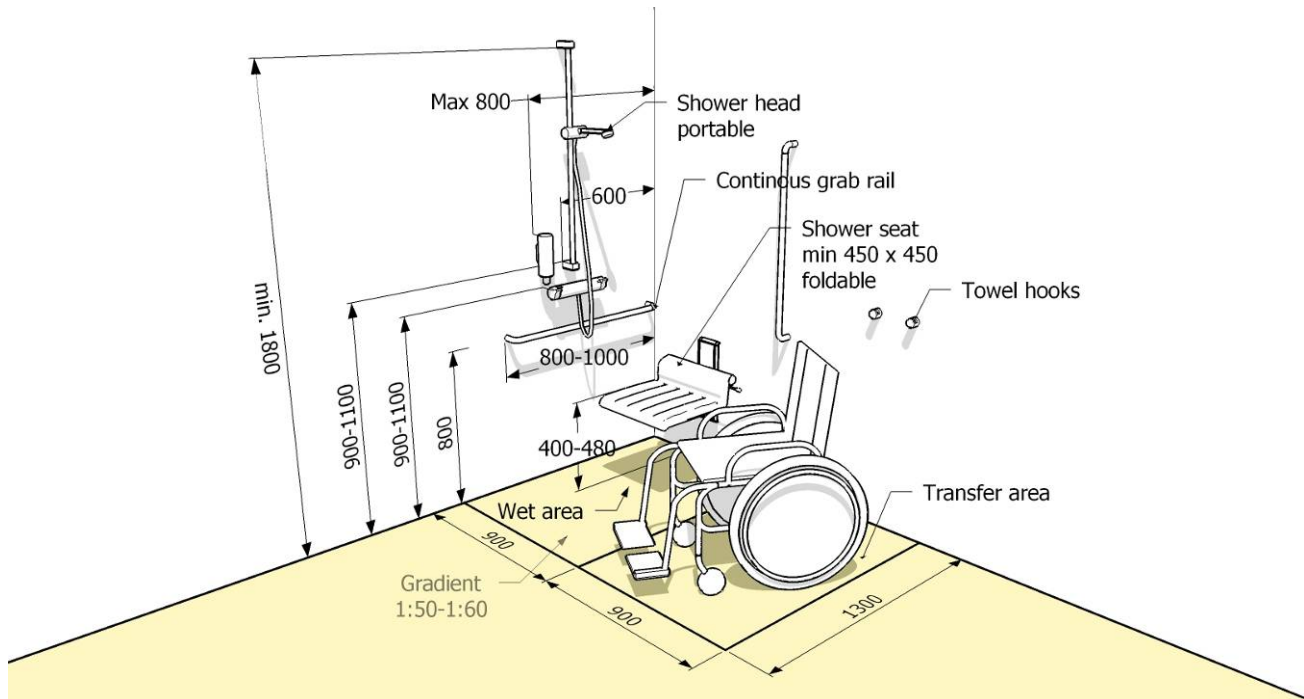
Example of a shower place with grab rails, adjustable shower head and folding seat
